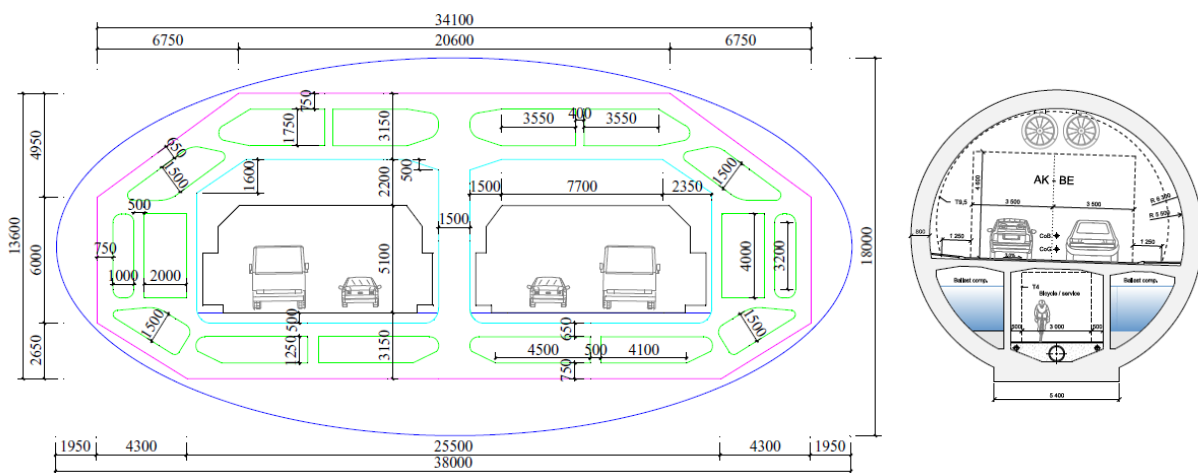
Cross-section shapes of the tunnel [mm] [6]
